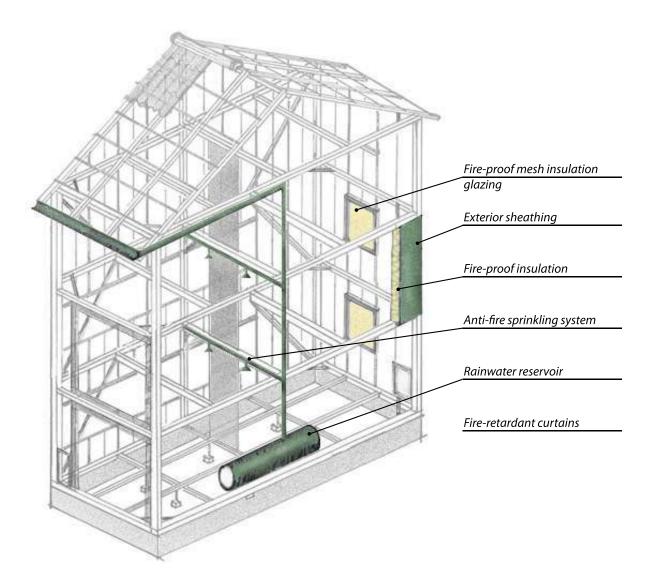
Fire-proof reinforcement of a detached house. Credit: VANKOVA Kalina.
